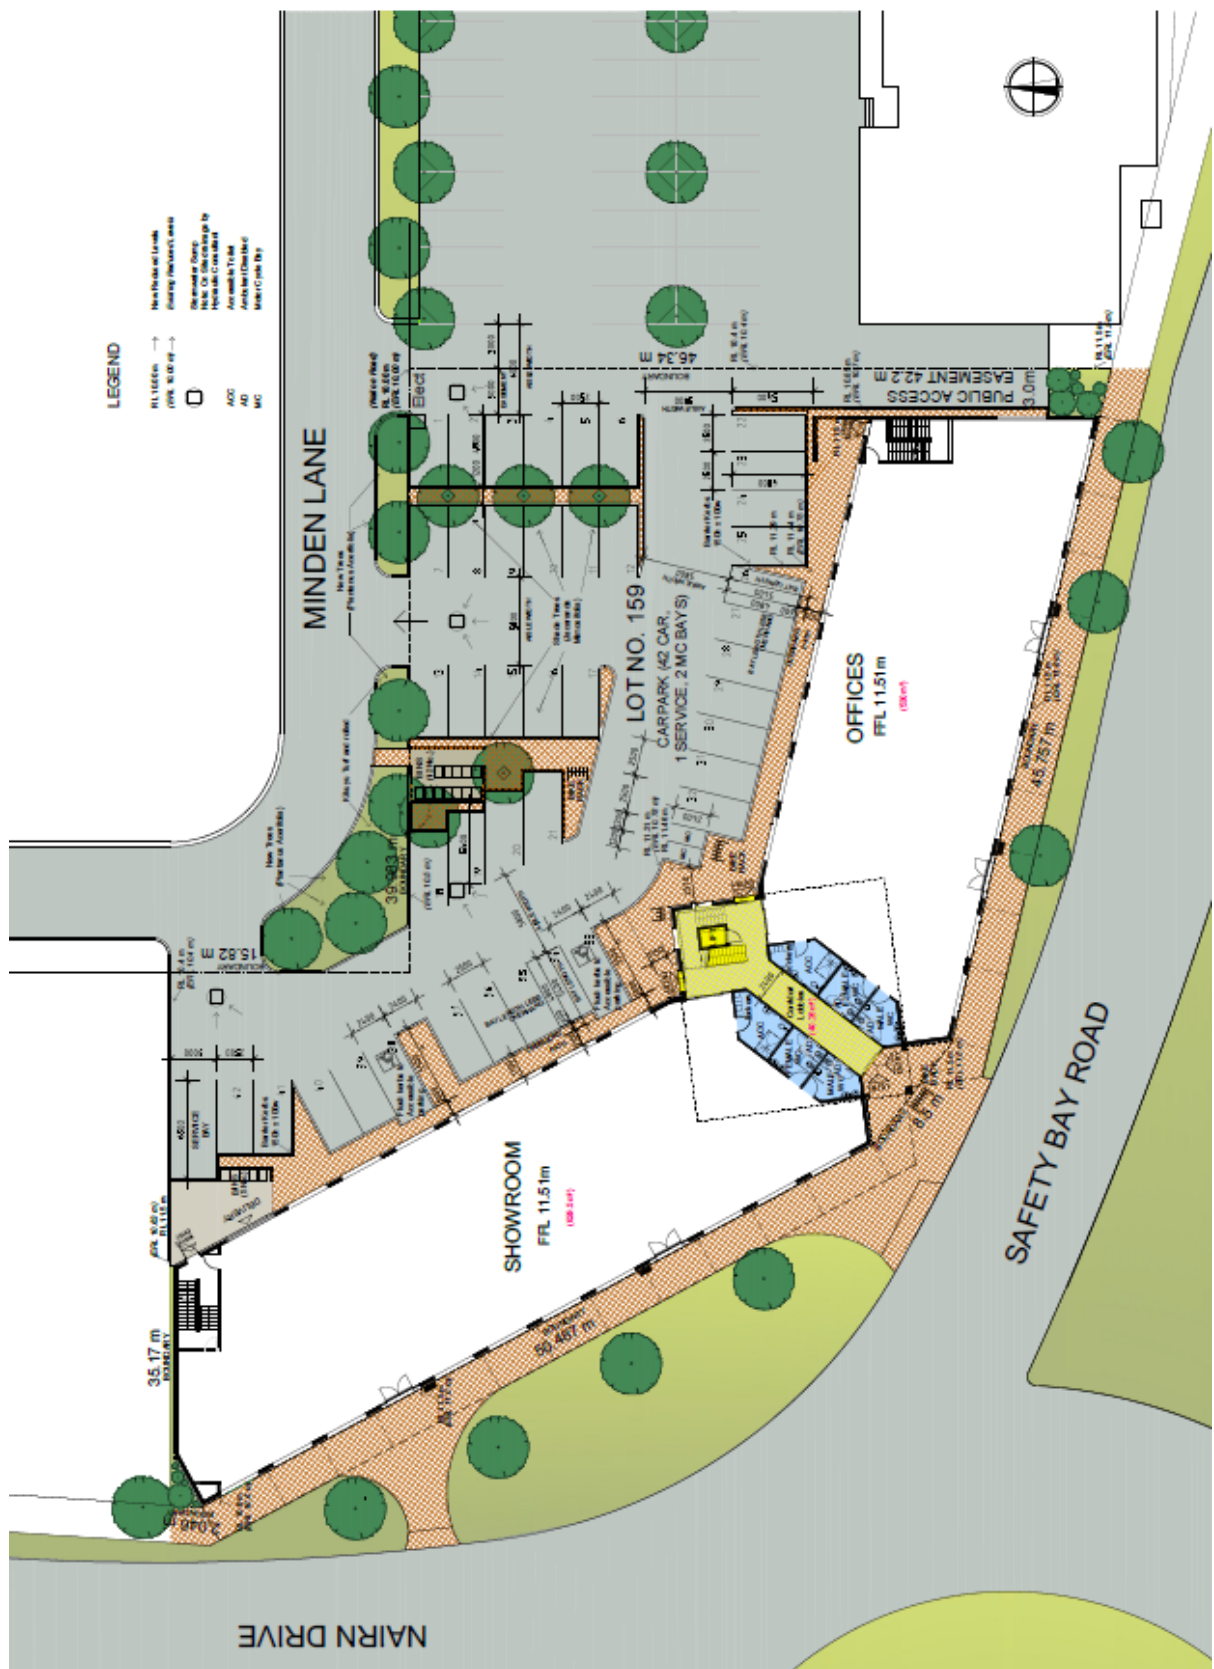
Revised (Current) Site and Ground Floor Plan (11.12.2015)
